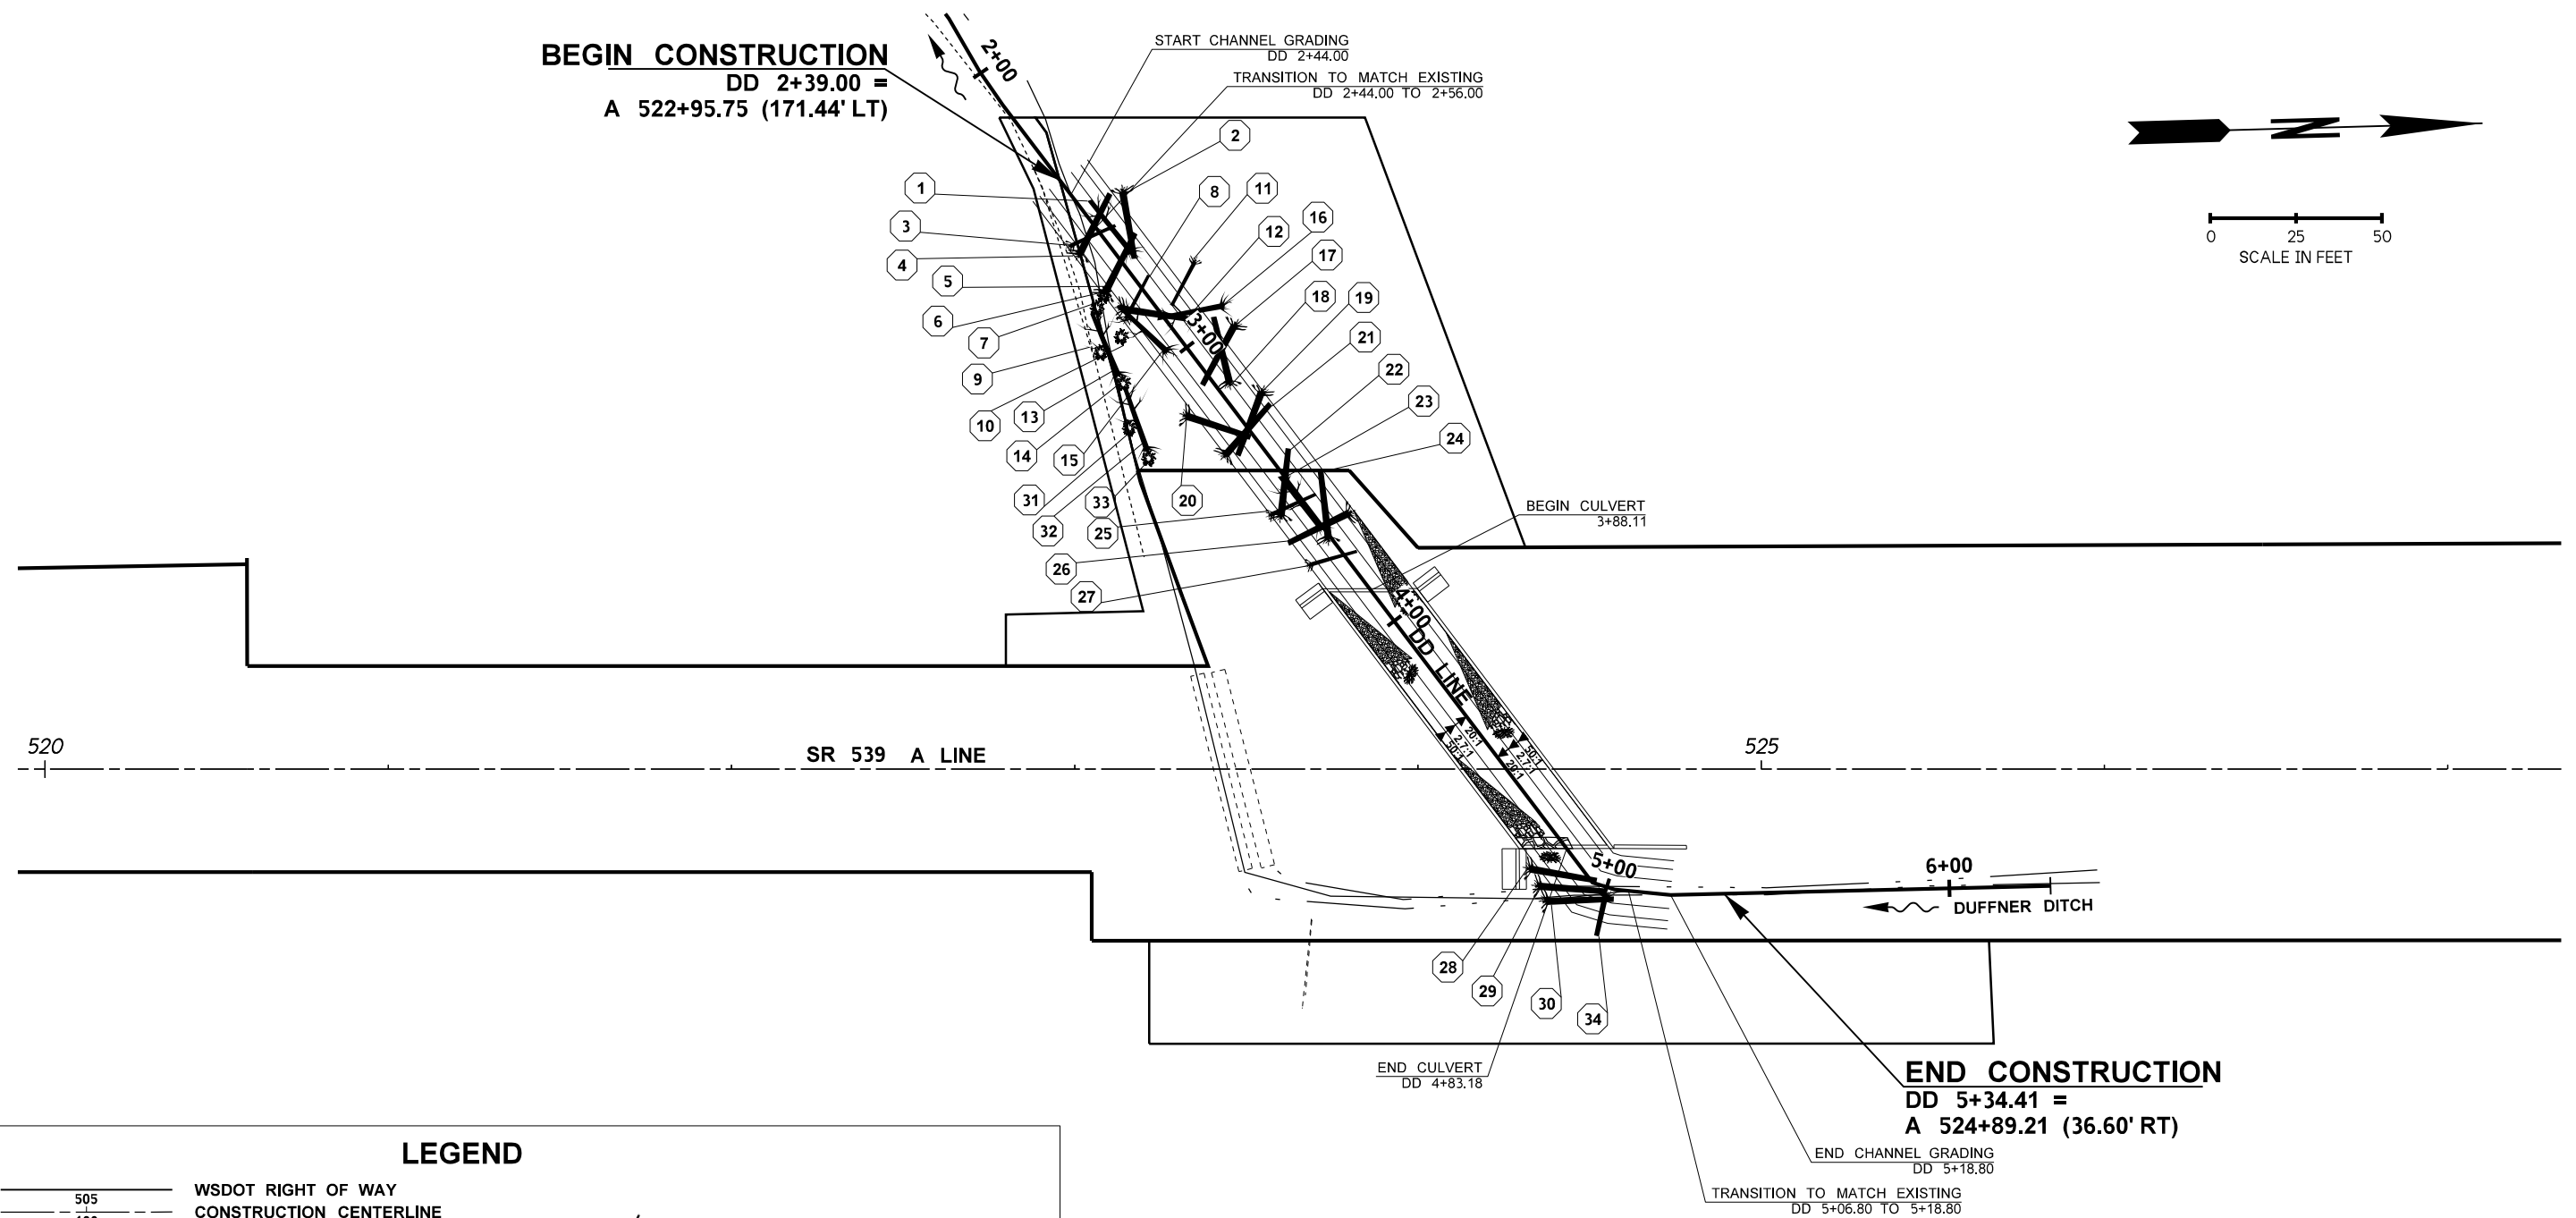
DETAIL VIEW - QUARRY SPALLS PLACEMENT
